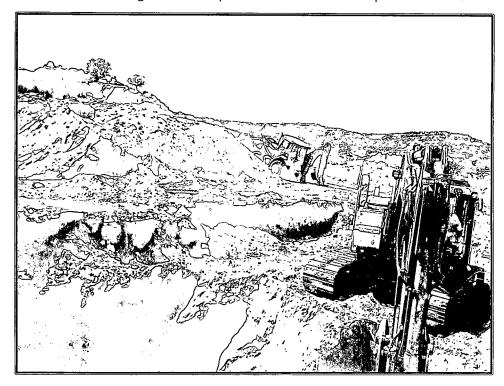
View of excavation equipment benched down to reach the base at approximately 25'.
